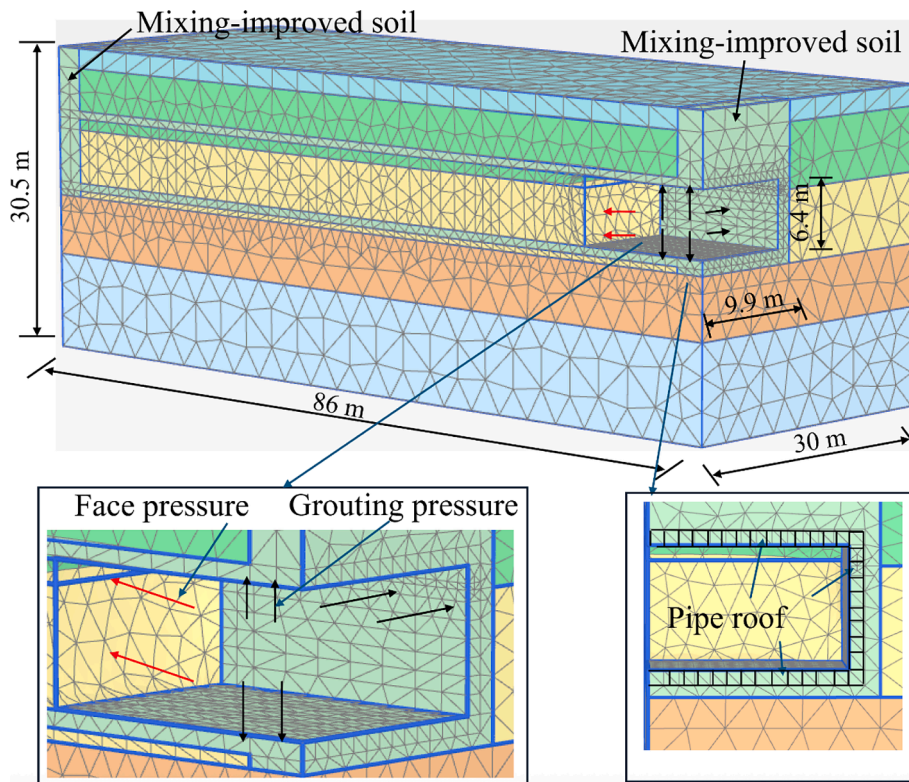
Three-dimensional numerical model of culvert jacking tunnelling.
